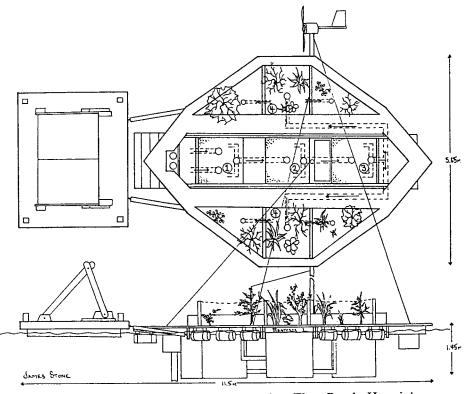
Plan and Elevation of Restorer 1 - Flax Pond, Harwich
